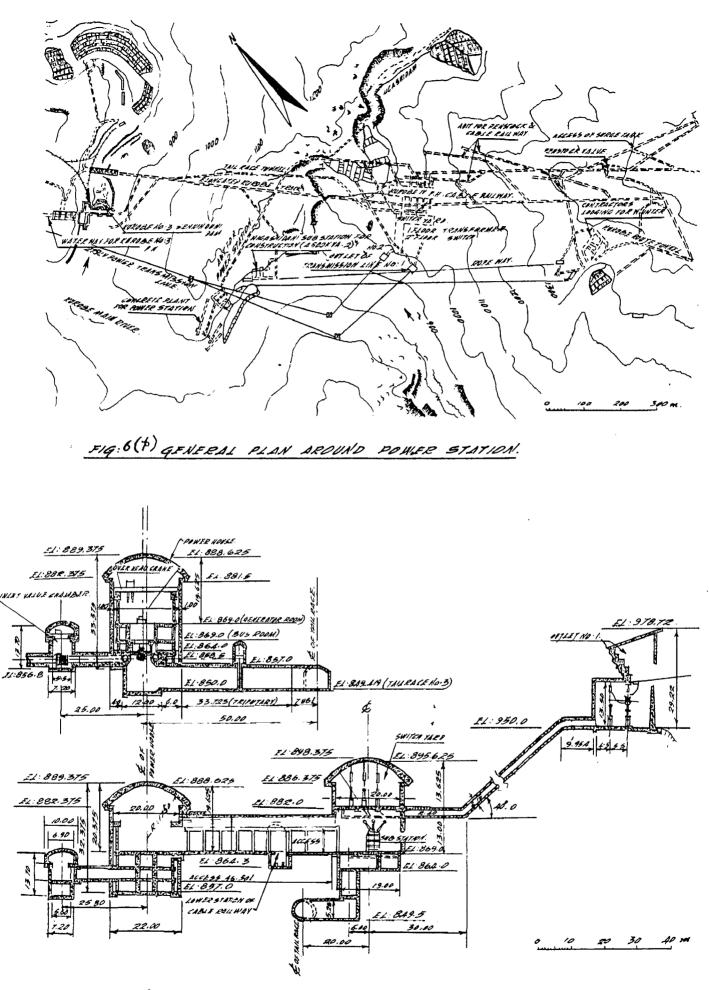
(A) CROSS SECTION OF POWER HOUSE.
